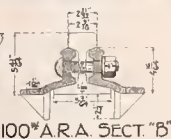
Type of Roadbed and Rail Section Used on the Magnolia Cut-Off.
